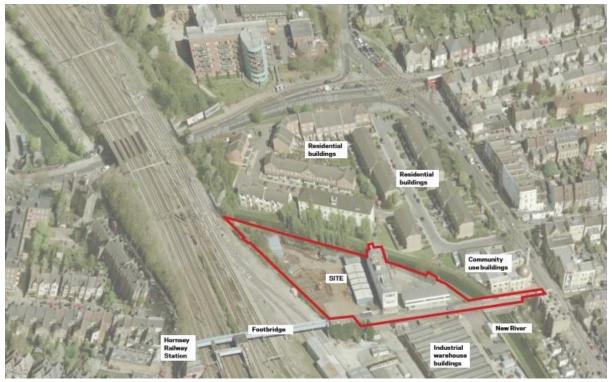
Hampden Road Redline Site Boundary, with WICC to the north.
